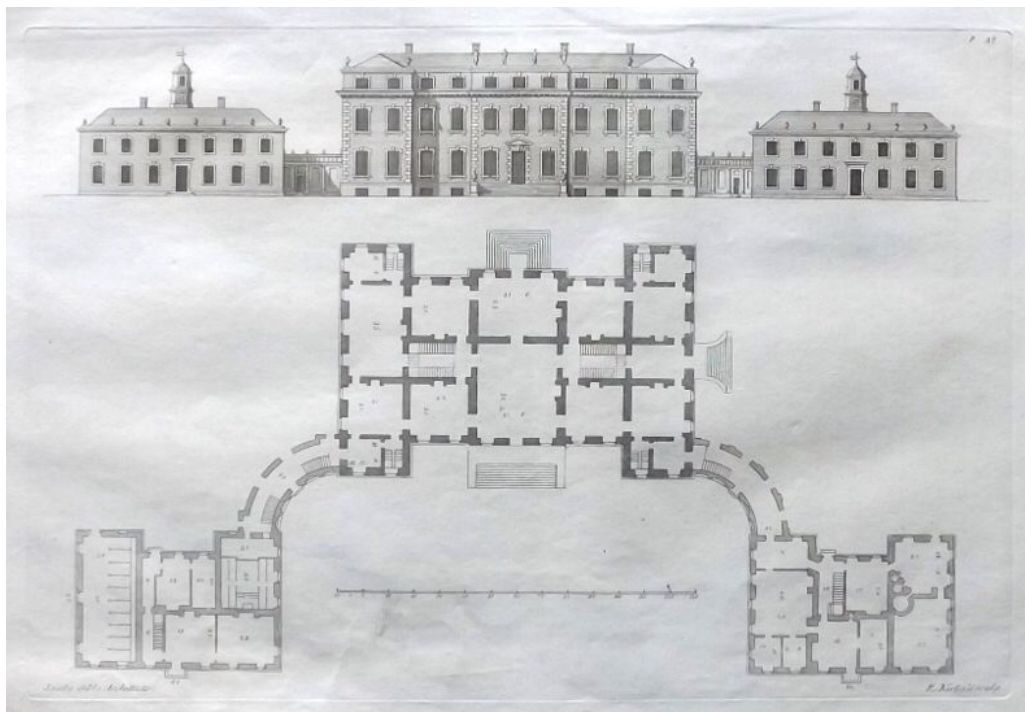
Elevation and plan of Ditchley Hall, plate from *A Book of Architecture, Containing Designs of Buildings and Ornaments*, by James Gibbs (London, 1728).
